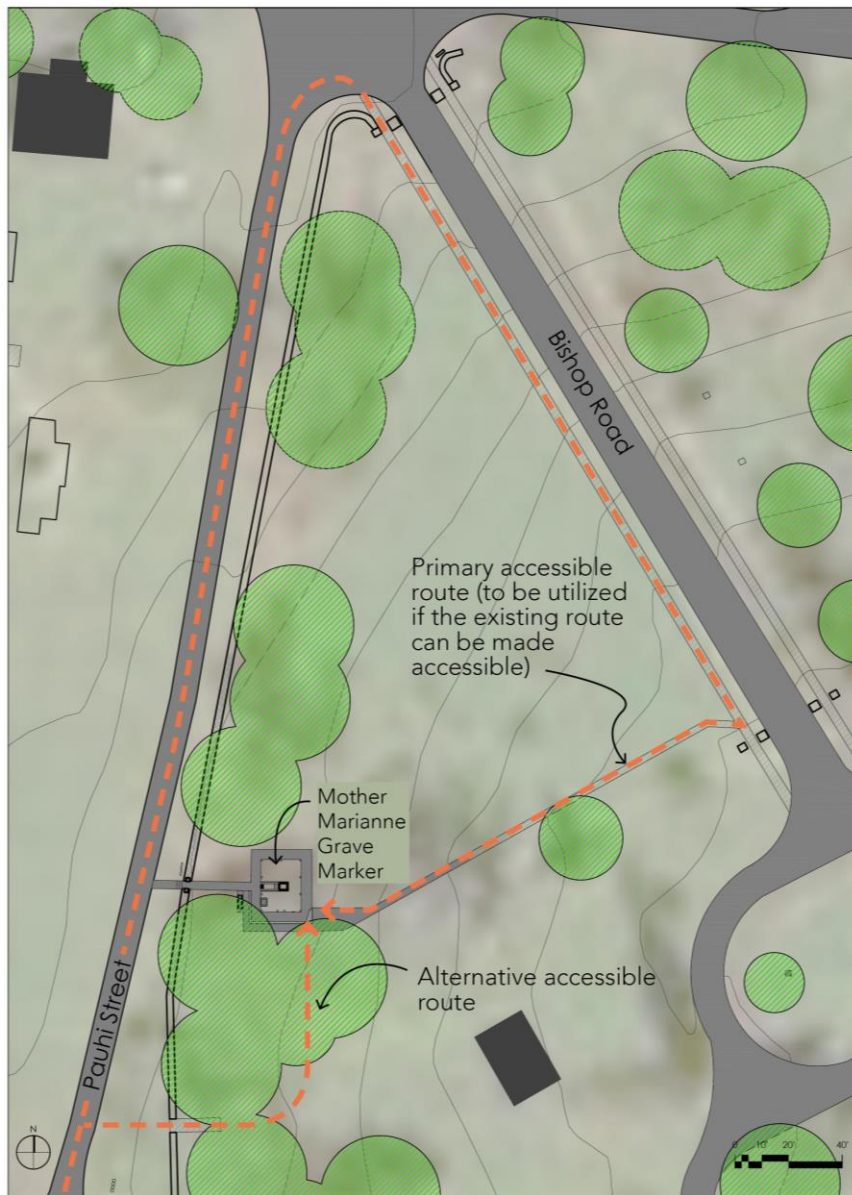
Diagram illustrating accessibility plan for a landscaped area. (Source: LSHLA)
